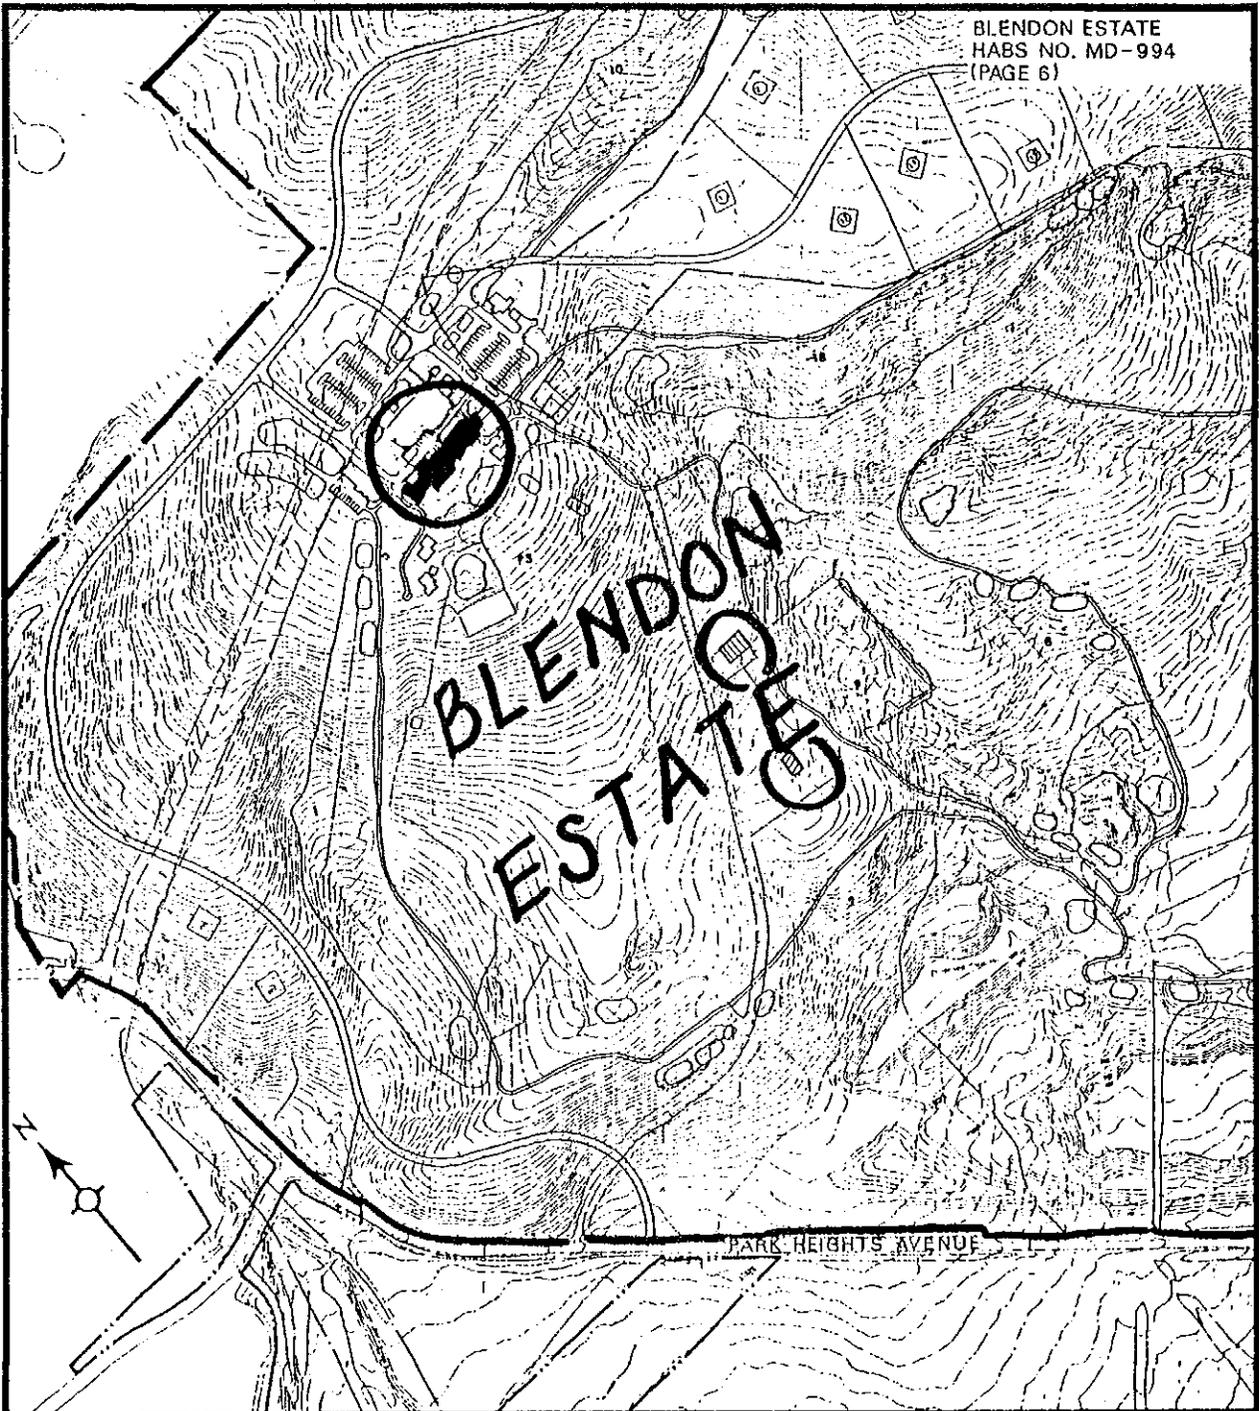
SKETCH SITE PLAN OF BLENDON ESTATE
